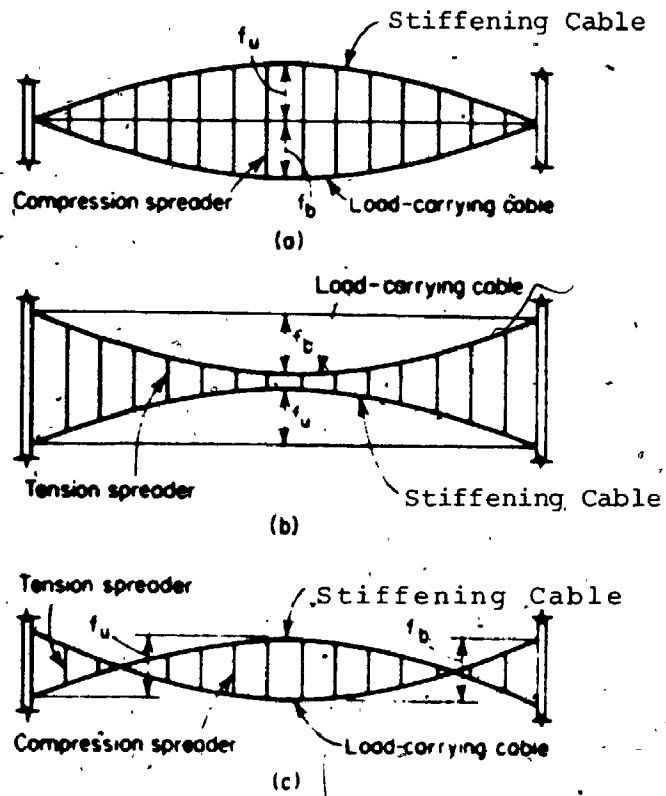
Stiffening Systems in Cable Roof Structures
